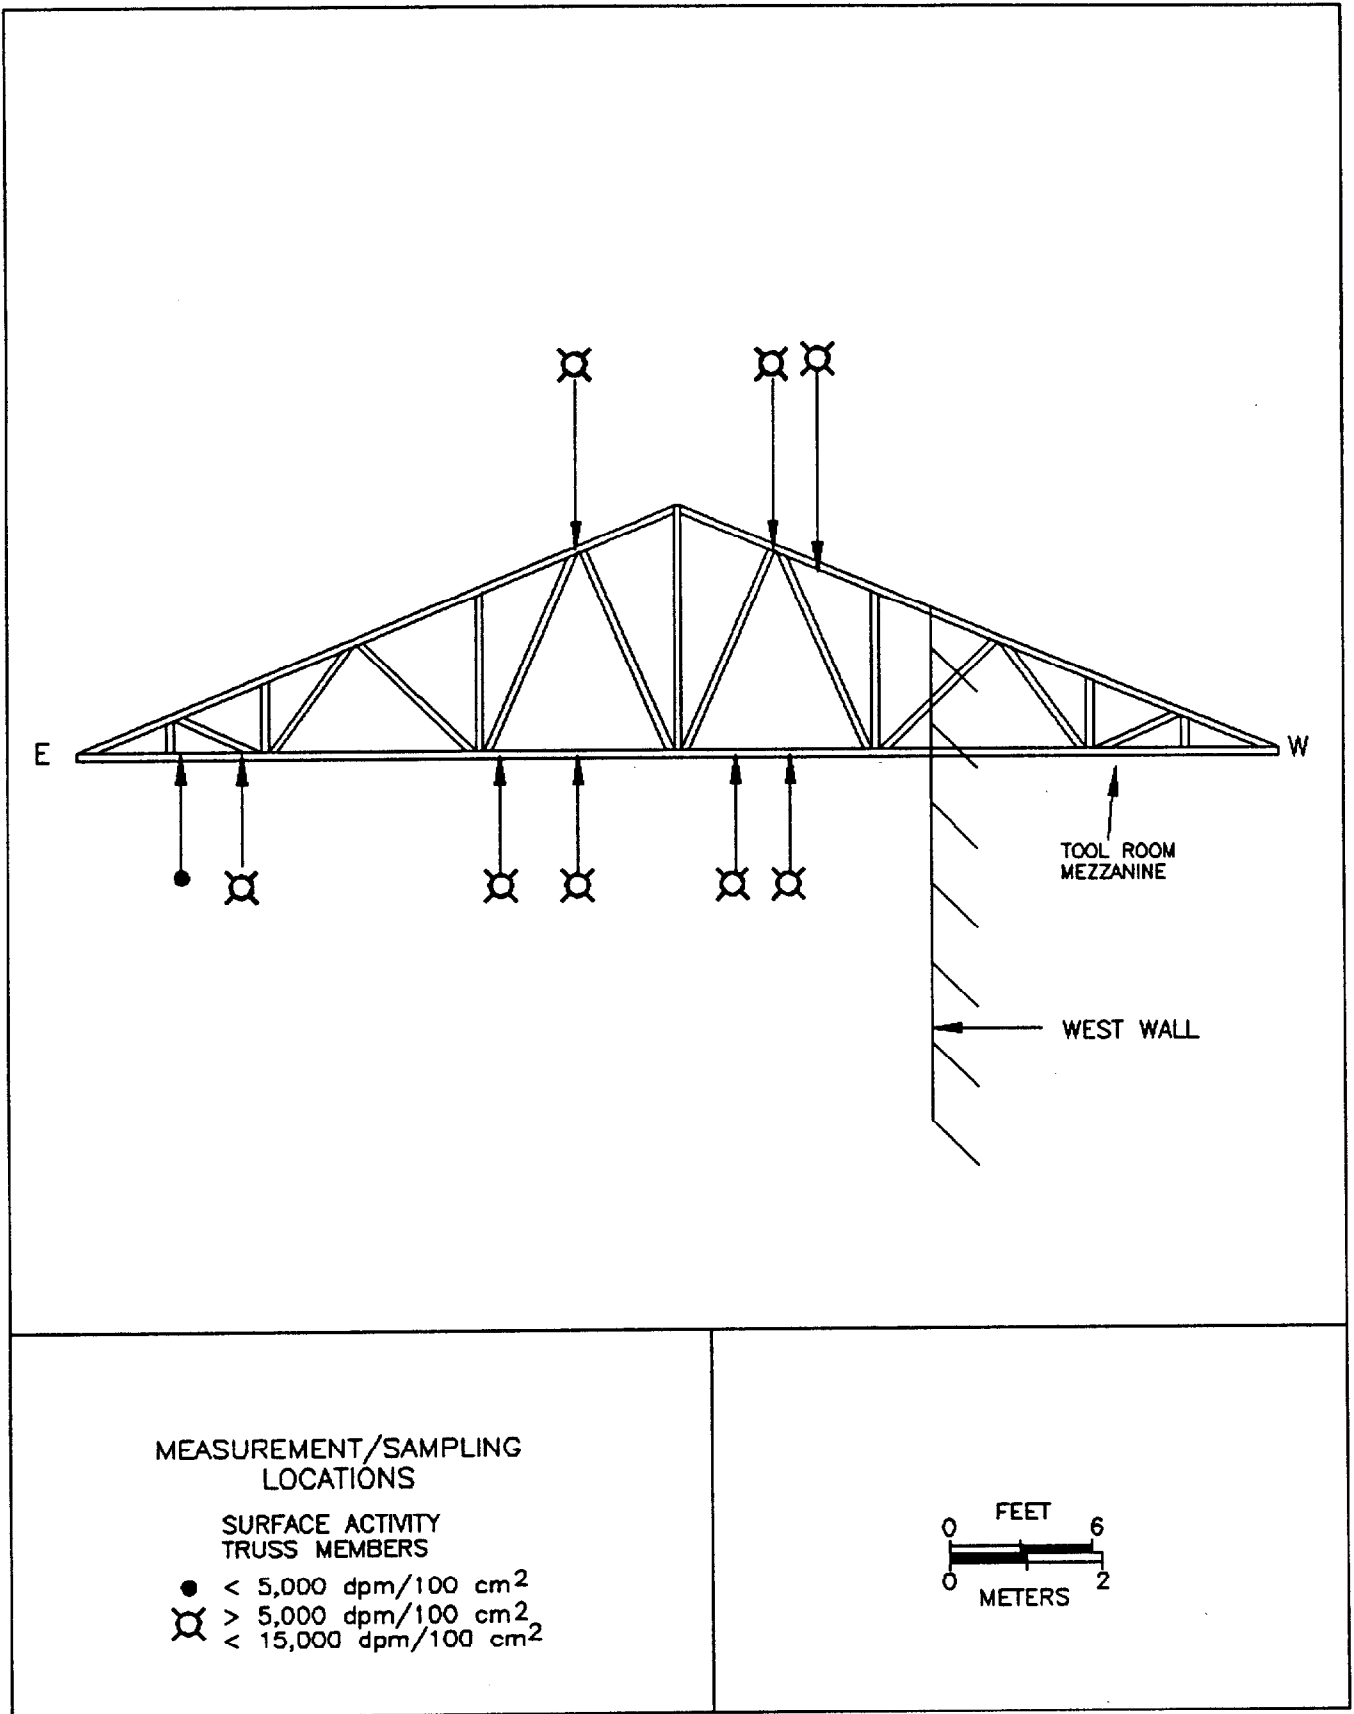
Building 8, Truss 2 – Measurement and Sampling Locations
